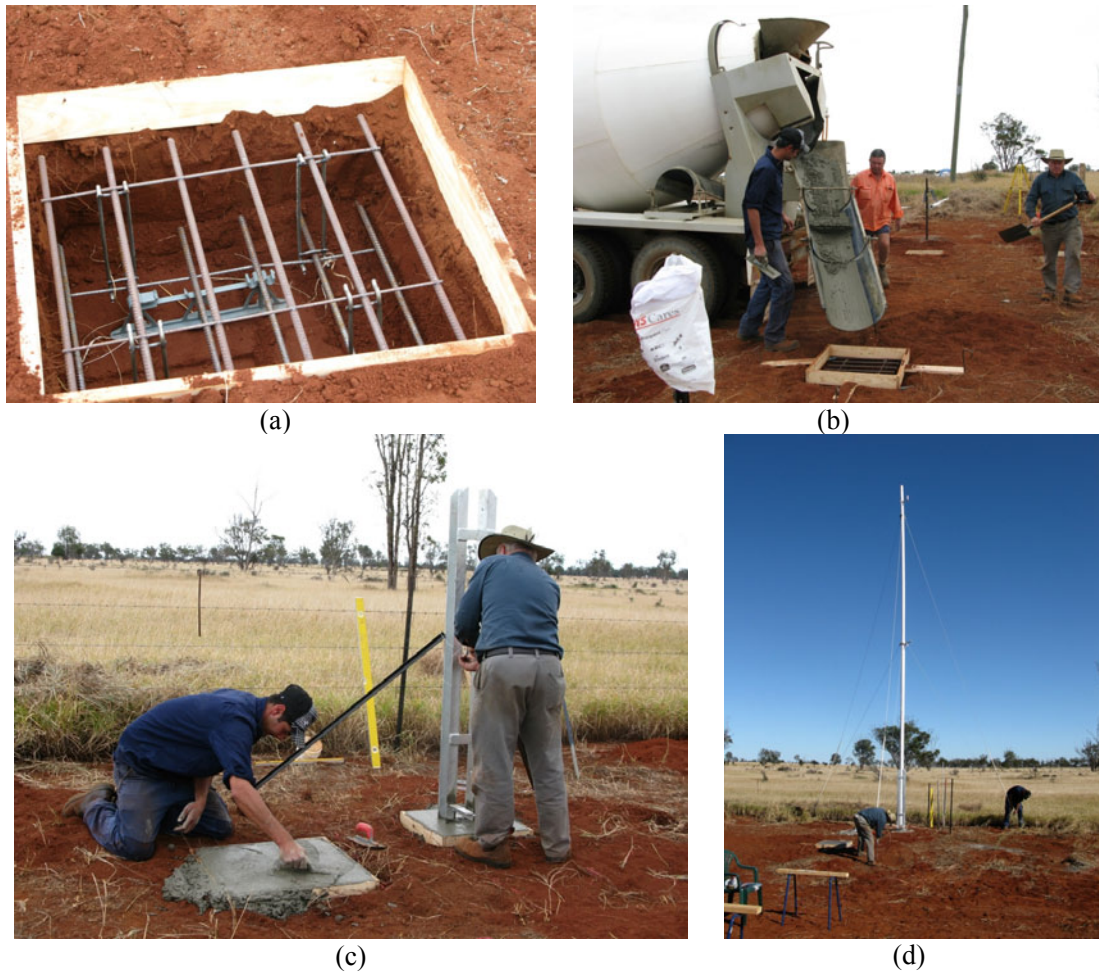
(a) A hole fitted with metal support frame and wooden planks for the concrete pads; (b) cement truck delivering concrete; c) levelling concrete pad and securing the metal stand for the mast; (d) securing guy-wires to anchor points
